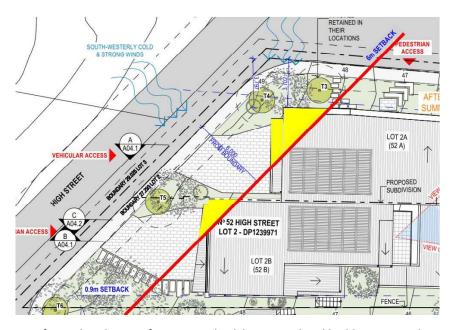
Extract of Site Plan showing front 6m setback lines in red and building encroachments in yellow.
